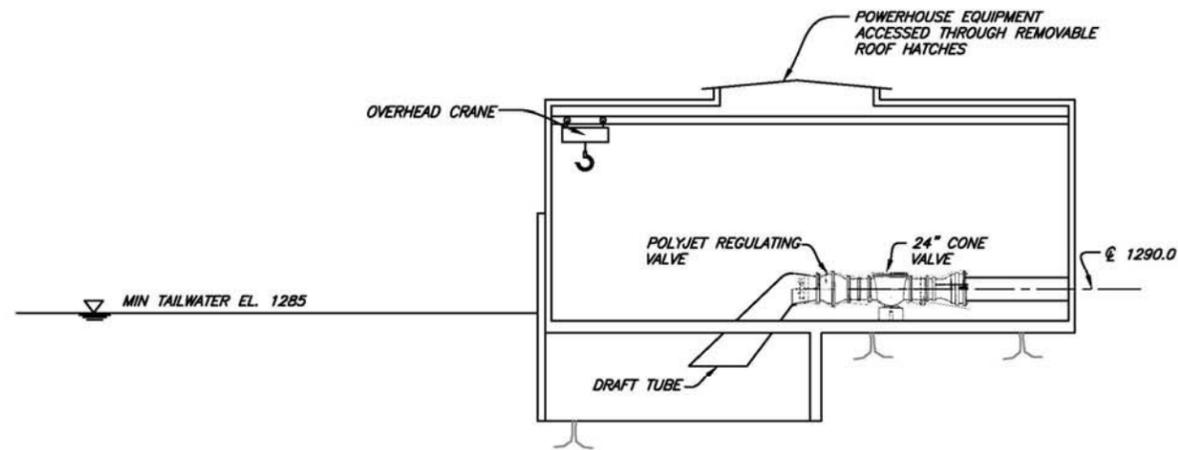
Neversink Development Powerhouse Plan
